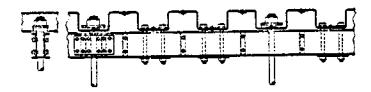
Standard wale details (U.S. Steel, 1976, pp. 71-73)
